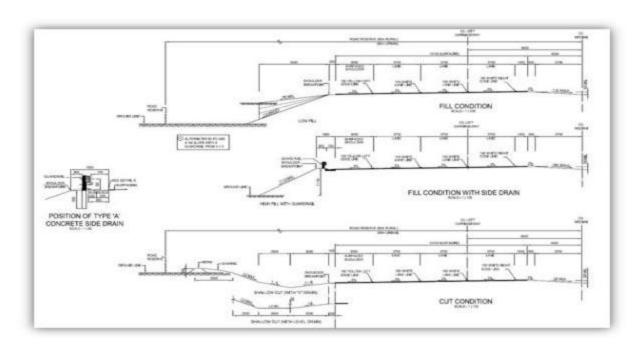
TYPICAL CROSS SECTION DUAL CARRIAGEWAY 6 LANE DIVIDED
